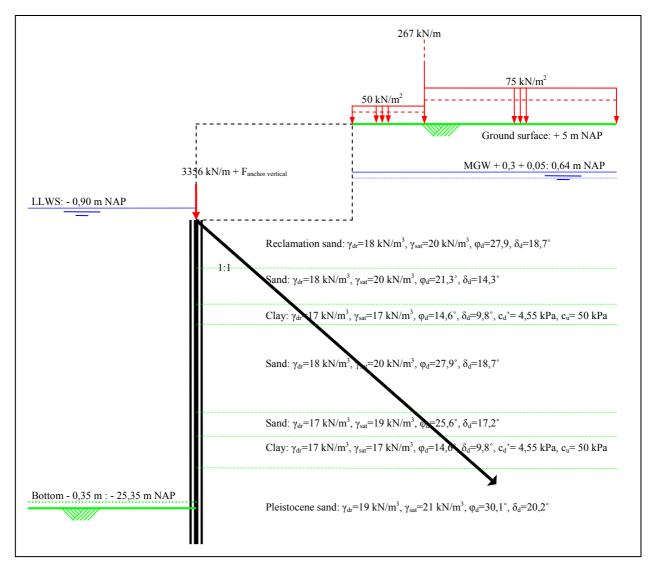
Design values (situation without drainage system) for sheet pile calculation according CUR 166
